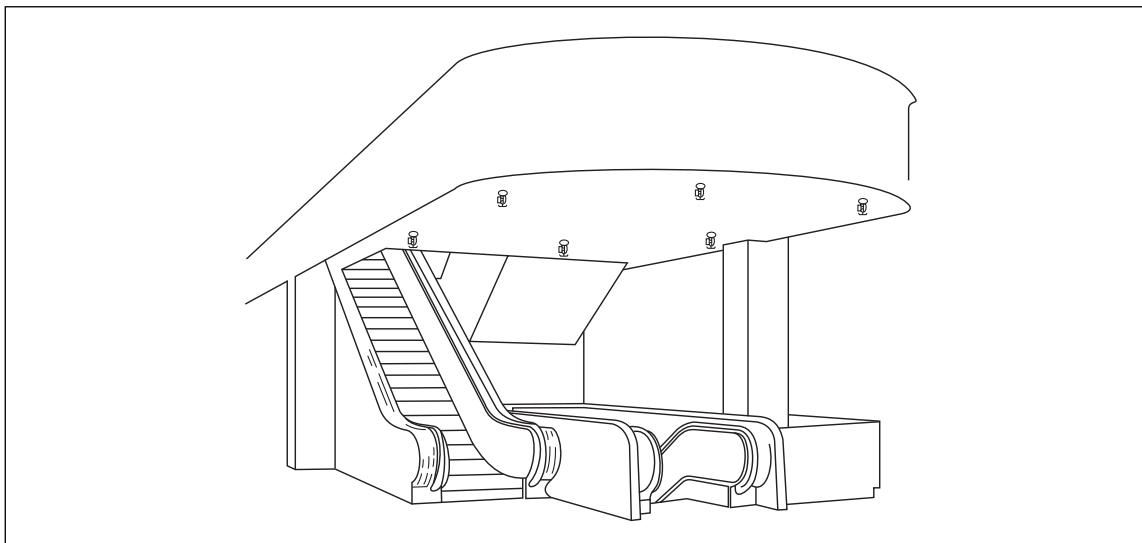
Protection of an escalator with a ceiling over the entrance and exit points of the escalator at each floor level
